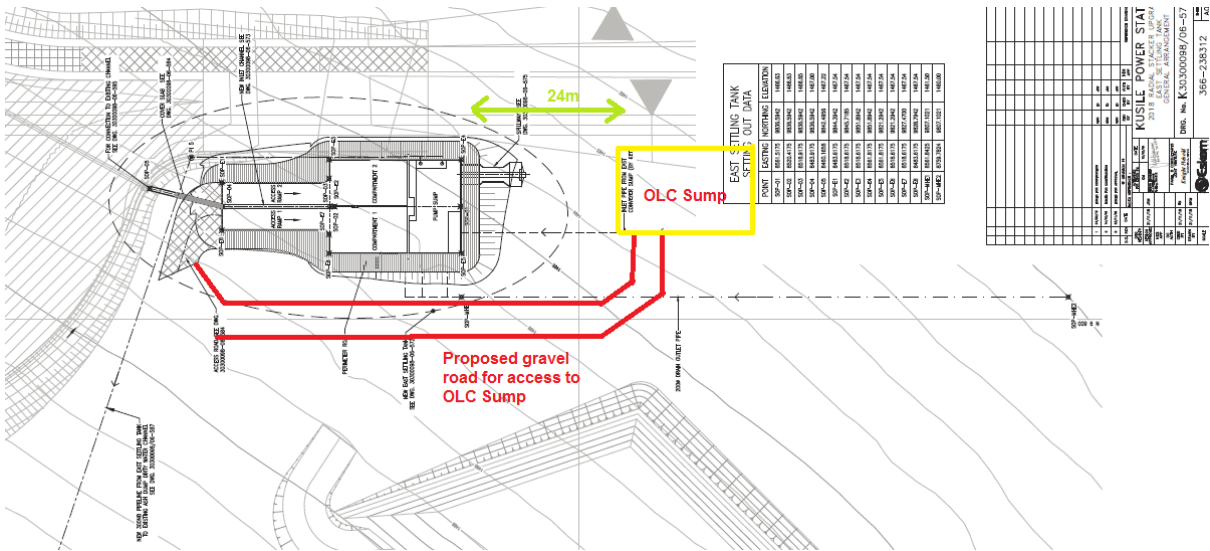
Proposed gravel road to the OLC 1&2 Collection Sump
